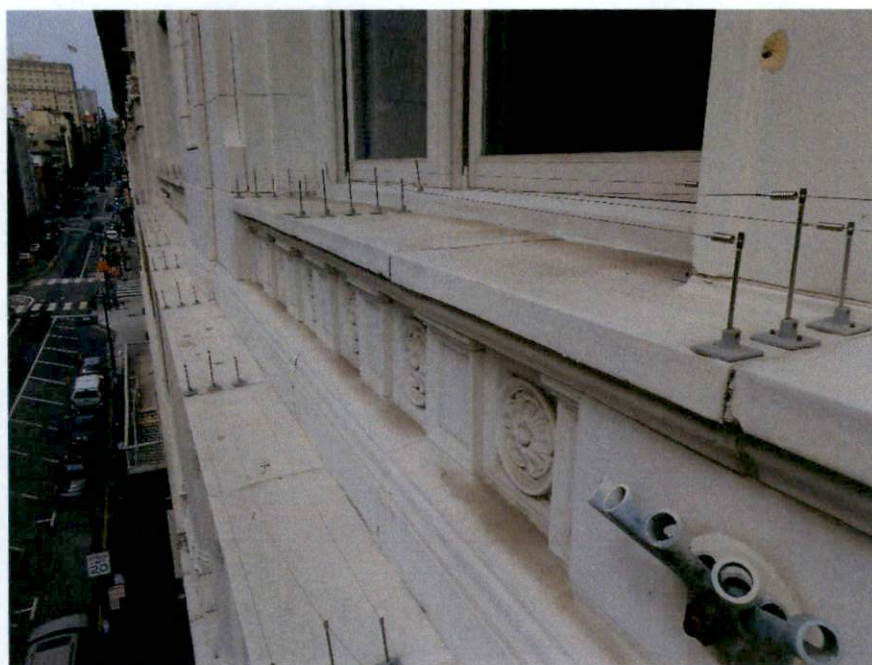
Photo E: View of Market Street elevation and terra cotta exterior. Looking west from outside 5th level window.
